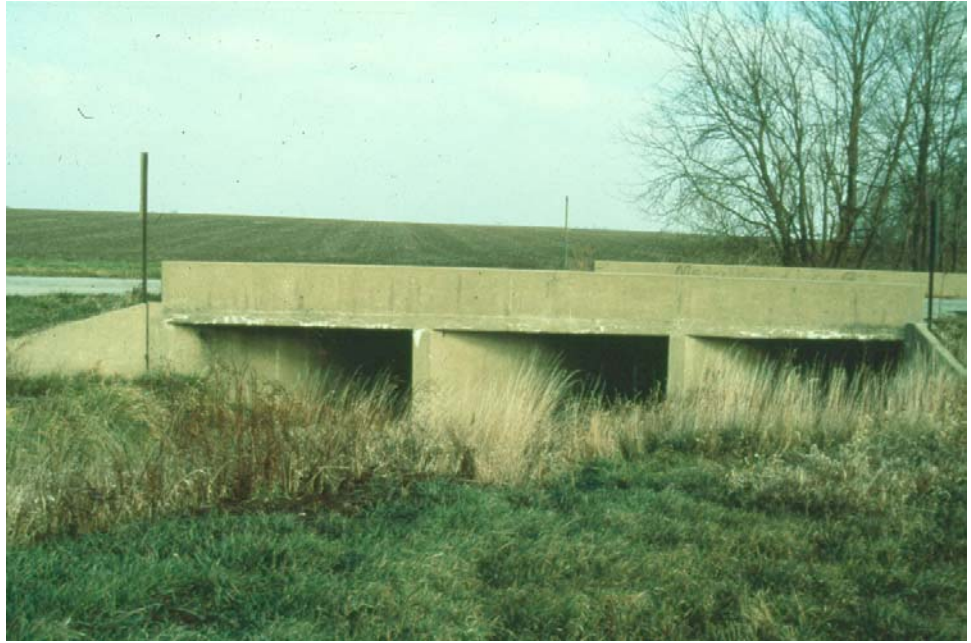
Typical Multi-span Rectangular Concrete Rigid Frame Bridge
